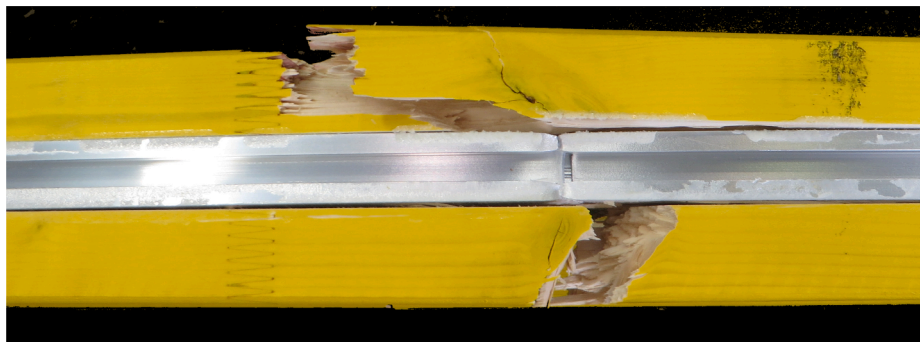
Failure of the dry *I tec pro* beam in case of the bending resistance test. Both, the aluminum profile and the spruce in the flange show a crack. In the spruce, this crack is related to a knot and the finger joint.
